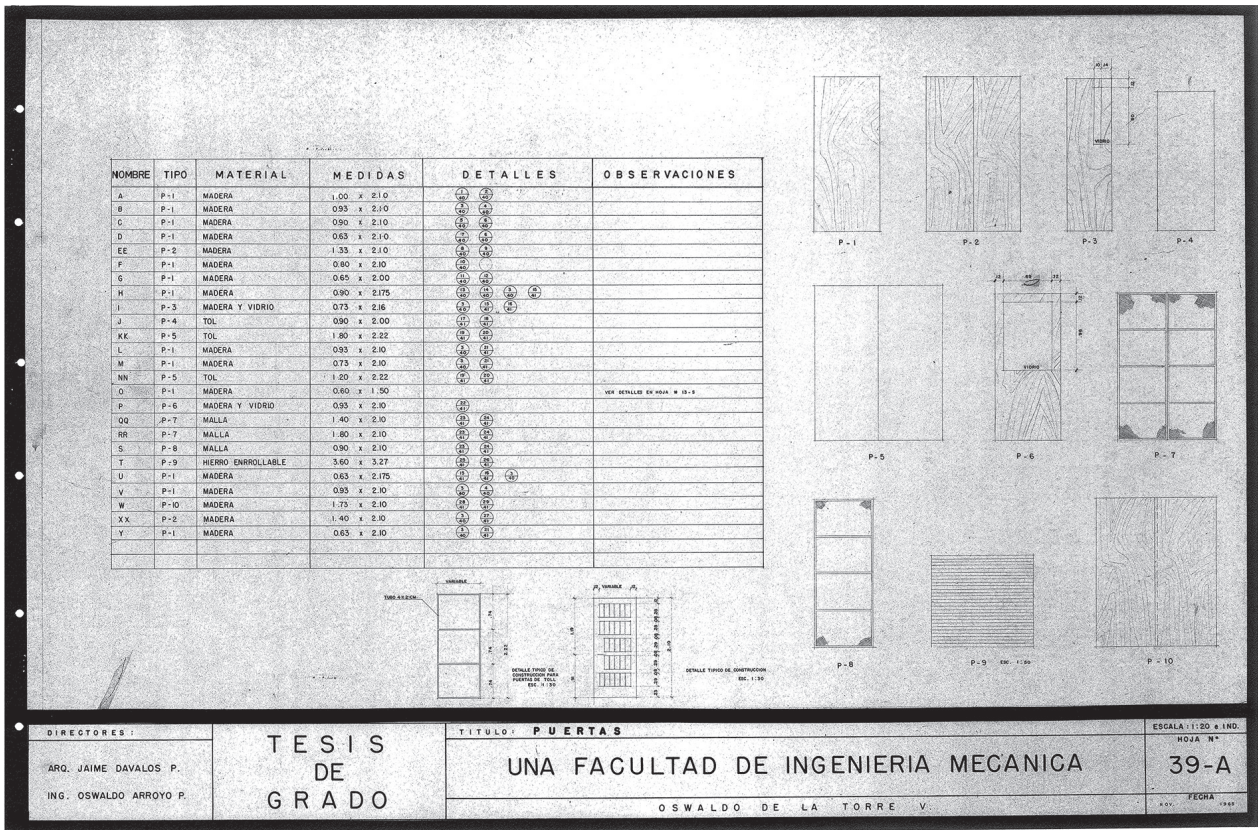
Details of doors Mechanical Engineering Building. National Polytechnic School (1963), Quito. Original plan, sheet N 35-A. (Source: Personal archive of Oswaldo de la Torre, 2016).
